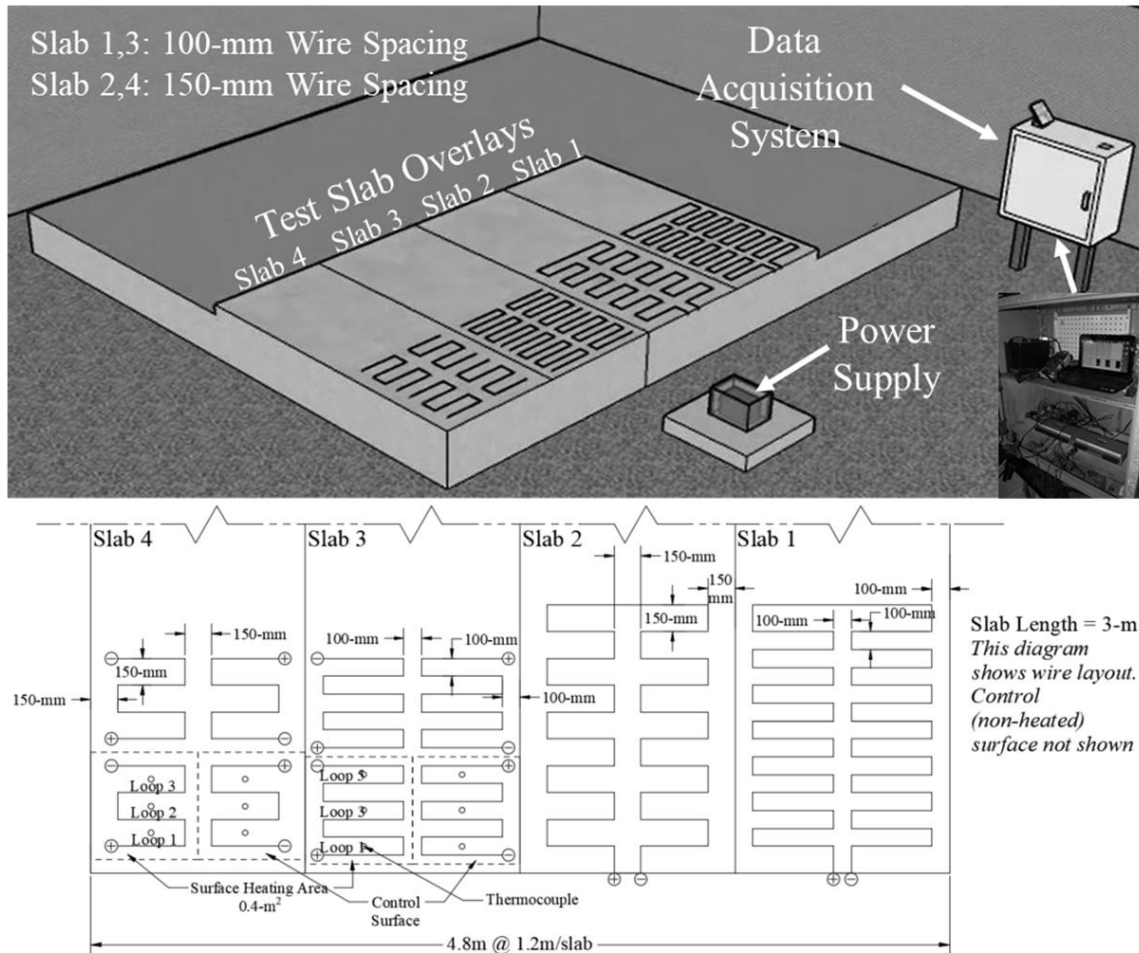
Heated section of outdoor concrete test slabs with surface heat wire layout.
